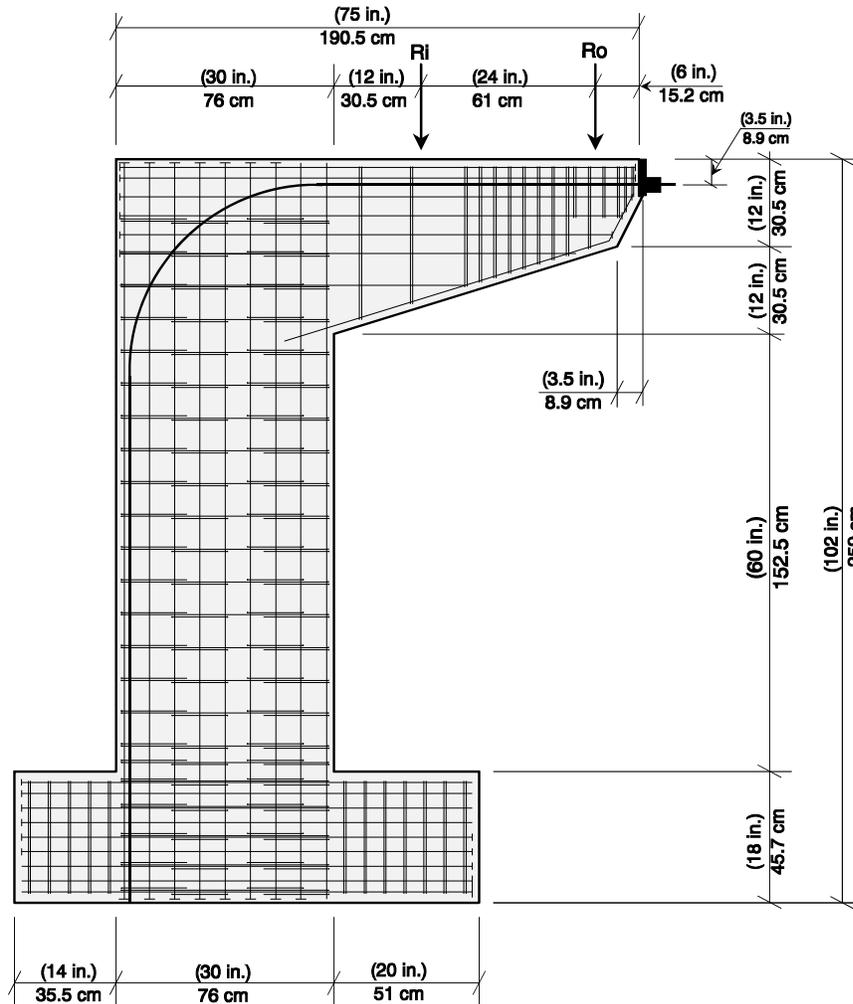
POJ-PU-74-TH overall reinforcement details
